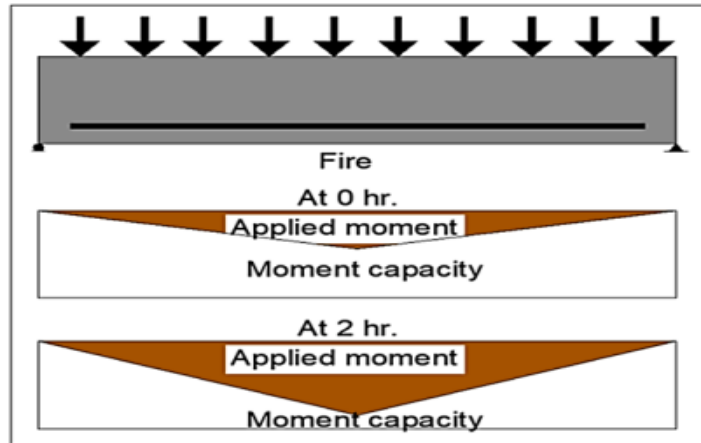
Impact of Fire on a Reinforced Concrete Slab with Simple Support [33].
